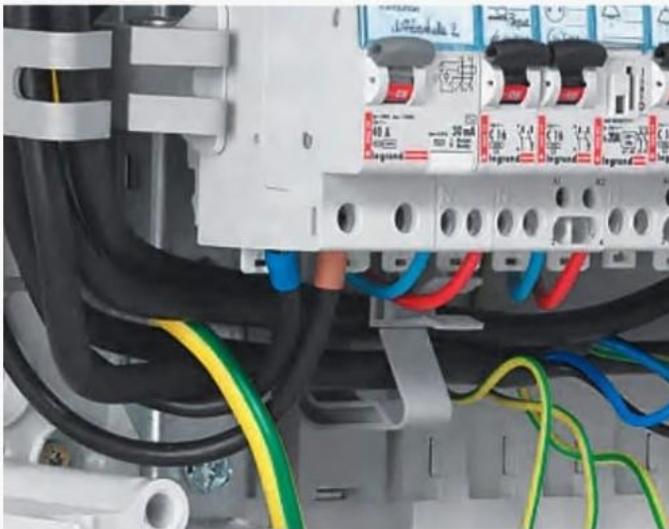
Conductors not touching, held in place with guide rings: Column 2 installation
